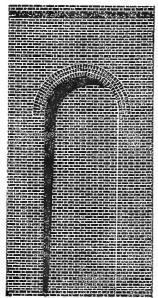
How to shade brick-paper for retaining-wall work, etc.
